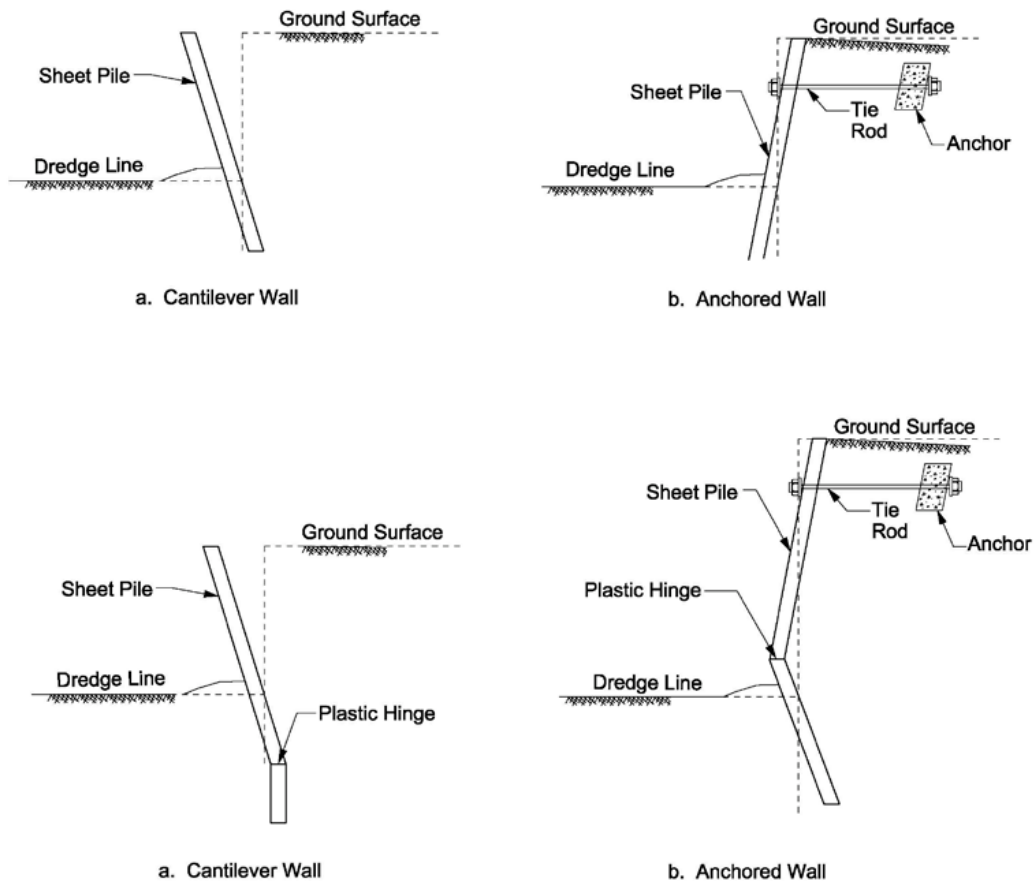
Flexural Failure of Non-Gravity Walls
